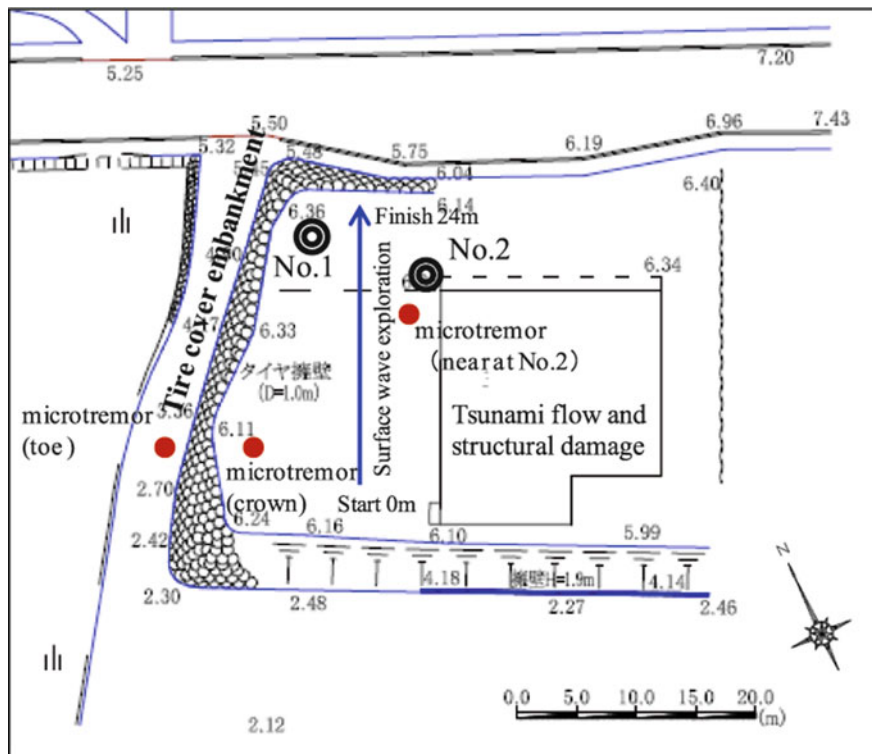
Plan view of the retaining wall and locations of the field survey
